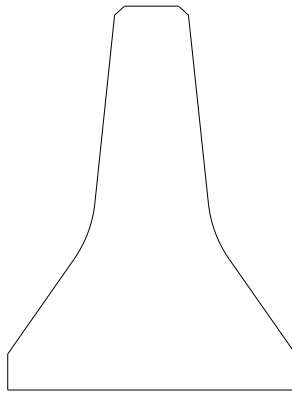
Temp Barrier Sec Cell (Barriers and Rails Library)
